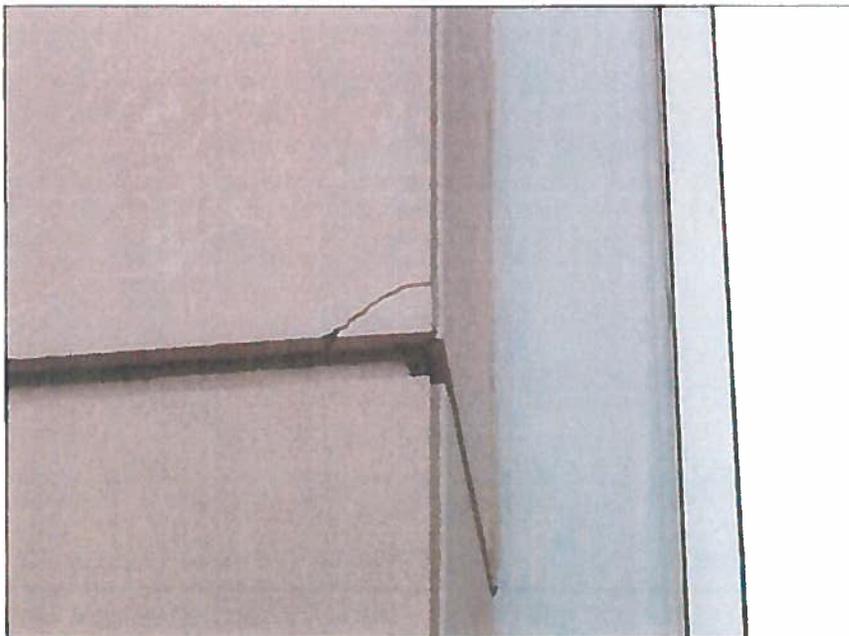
Cracked limestone at north end of bridge (west façade), loose piece should be removed as soon as possible.
